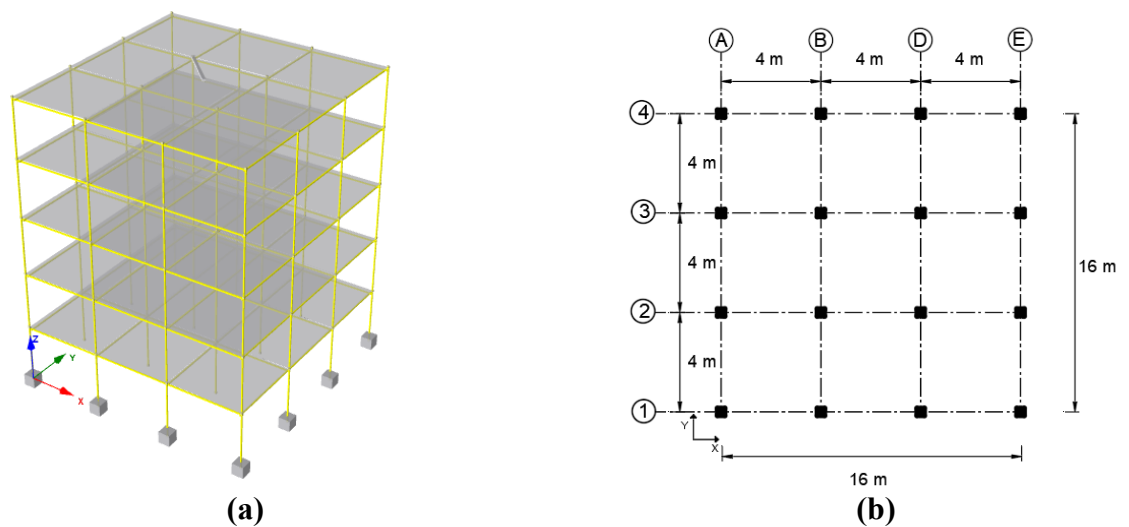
The selected building: (a) 3D view of structural model; (b) Floor plan.
